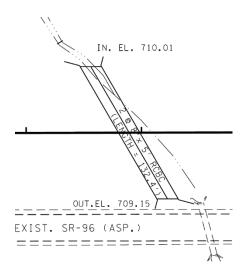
A-7B Example of Box Culvert as Shown on Present Layout
